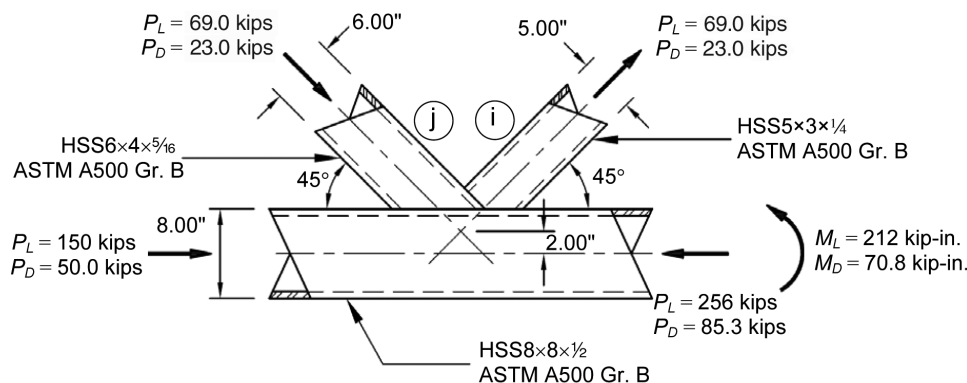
Welded overlap K-connection with rectangular HSS.
